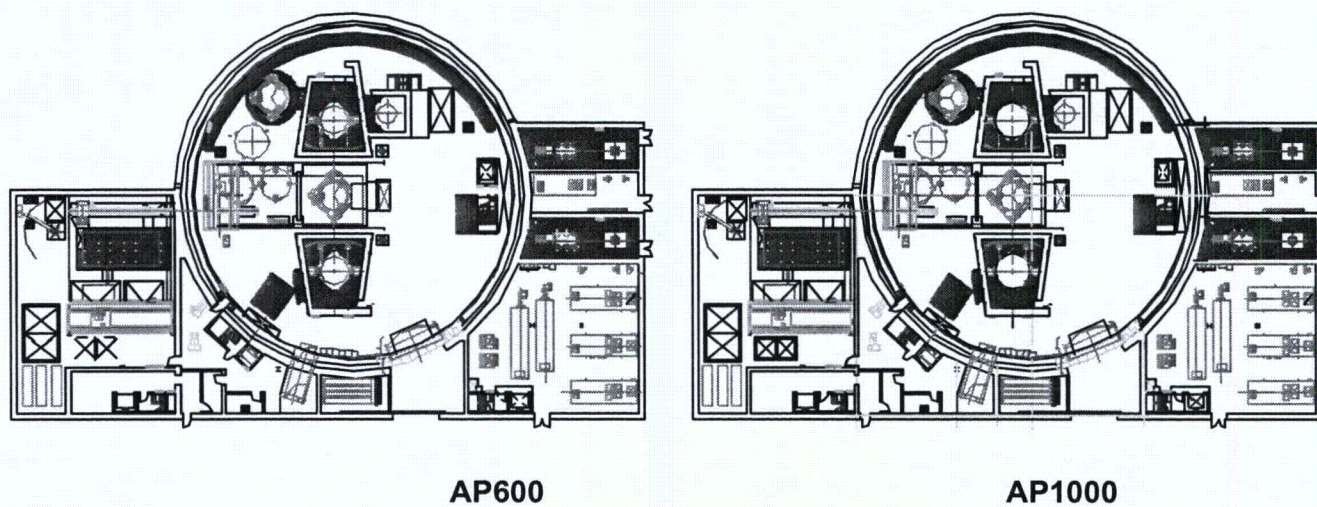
Westinghouse AP1000 and AP600 Plants (Plan)
